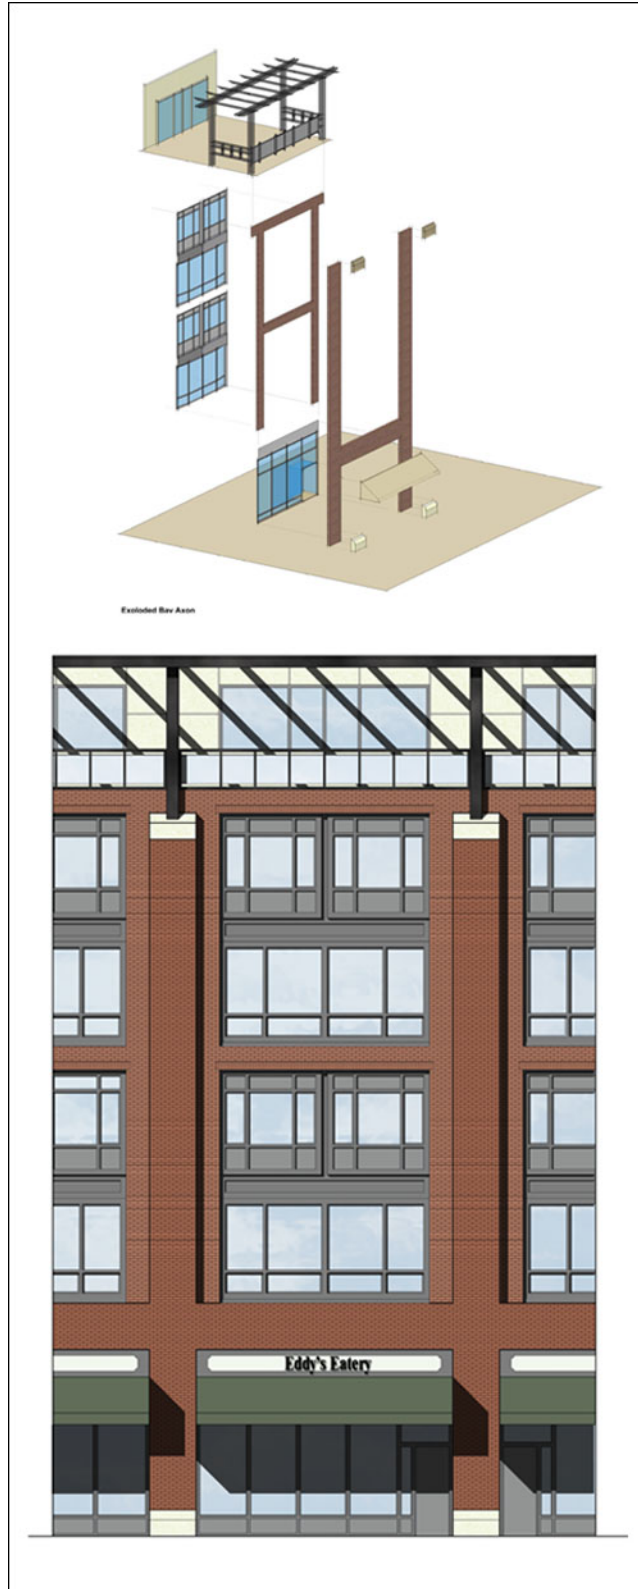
Exploded Axon and Typical Bay of Mixed Use Building on Edmondson Avenue
